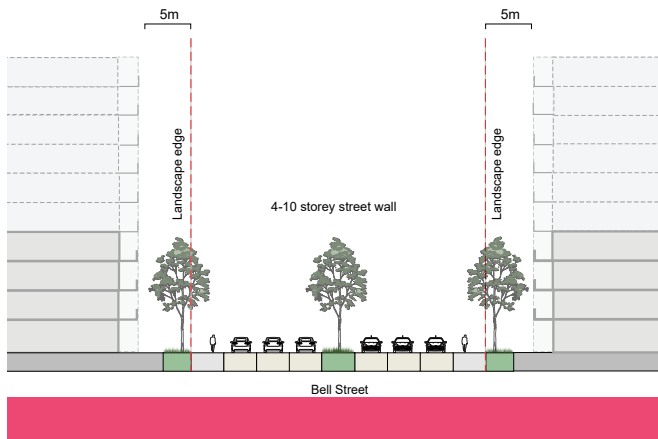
Bell Street, Bell Street Precinct. A 5m ground floor setback is proposed to manage amenity on this major road.
